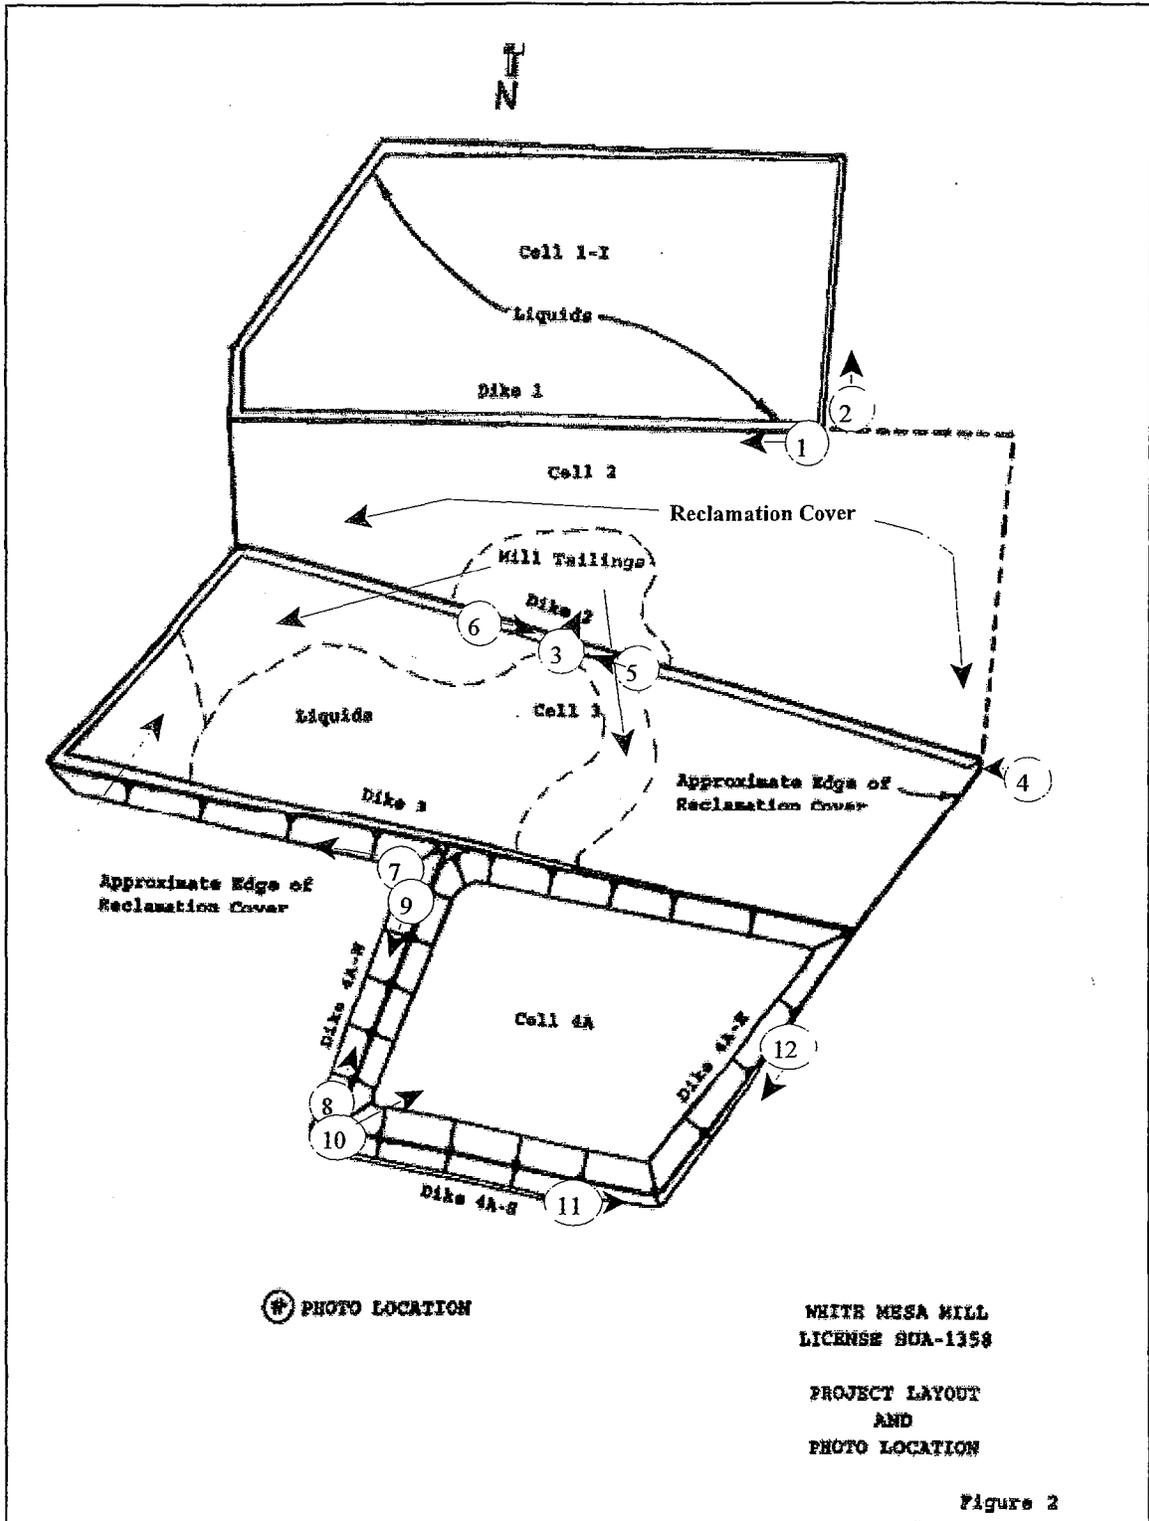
White Mesa Mill. Project Layout and Photo Locations
